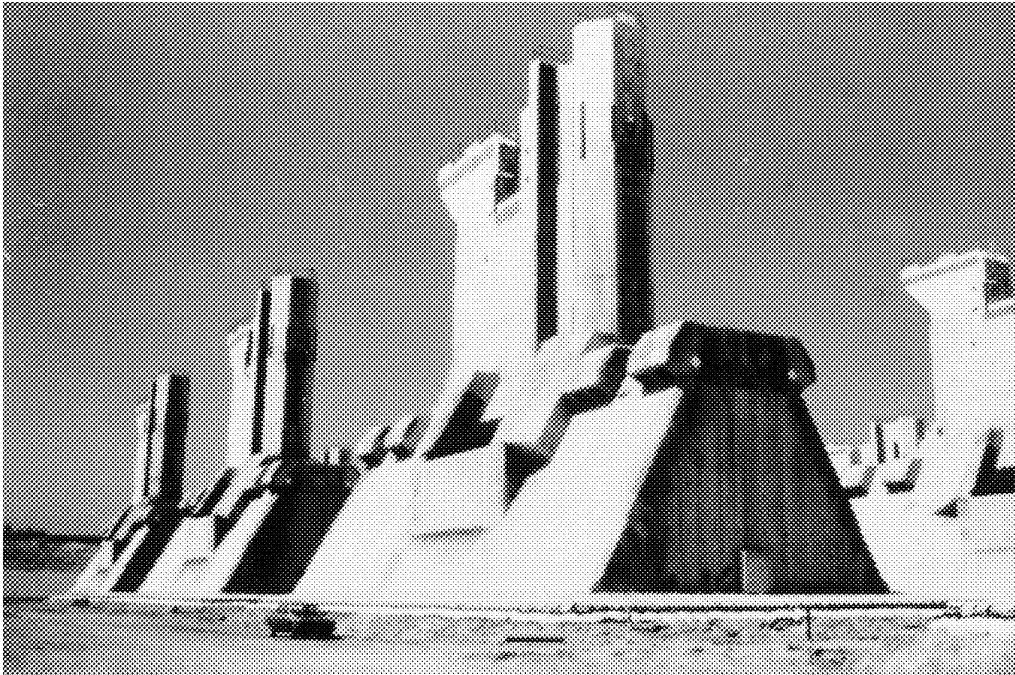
Precast piers for the Oosterschelde Storm Surge Barrier in the construction dock
